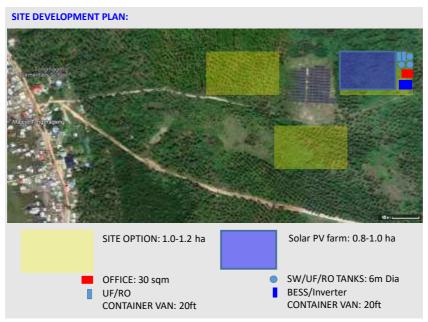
Site development plan for the desalination facility with additional 1 MWp solar PV system
